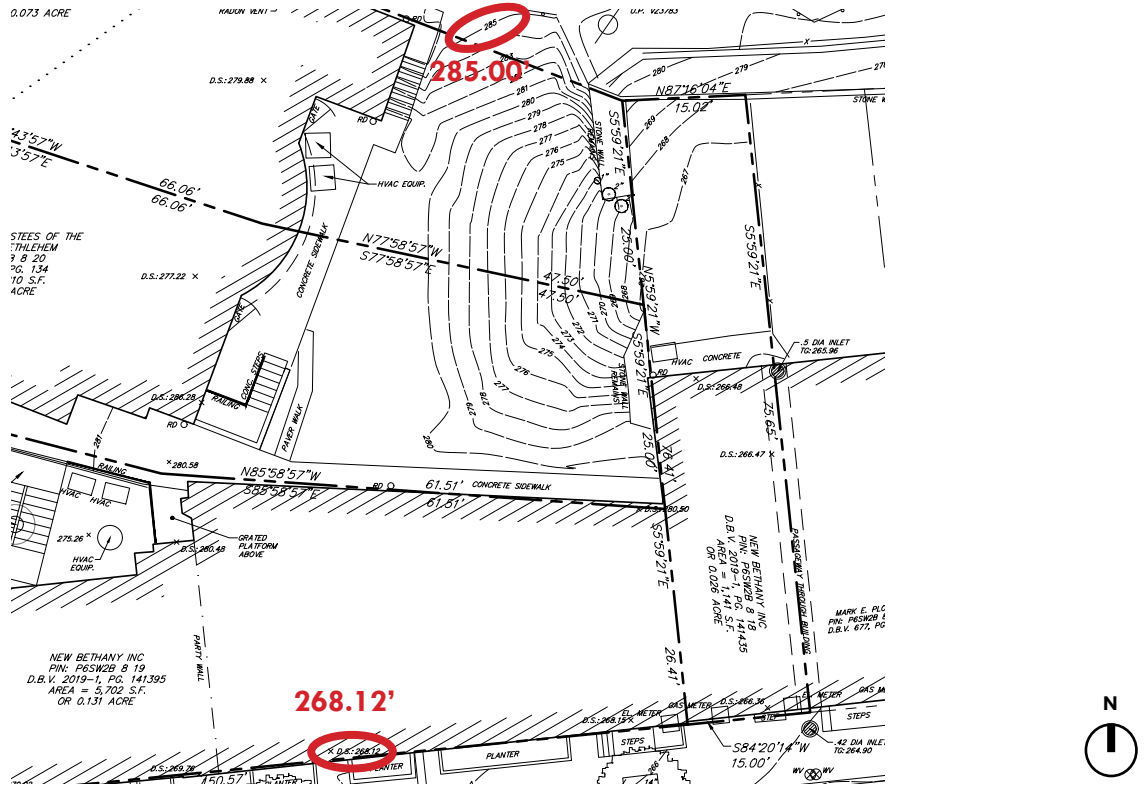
Enlarged View of Site Survey Plan, 335-339 West Fourth Street; Survey by Barry Isett Associates, Inc. [For full-size plan, refer to separate drawing package] Grades indicated in Red Circles. Low end at bottom of plan (West Fourth Street) and high end located at top of plan (Parking Lot accessed via Wyandotte Street).
